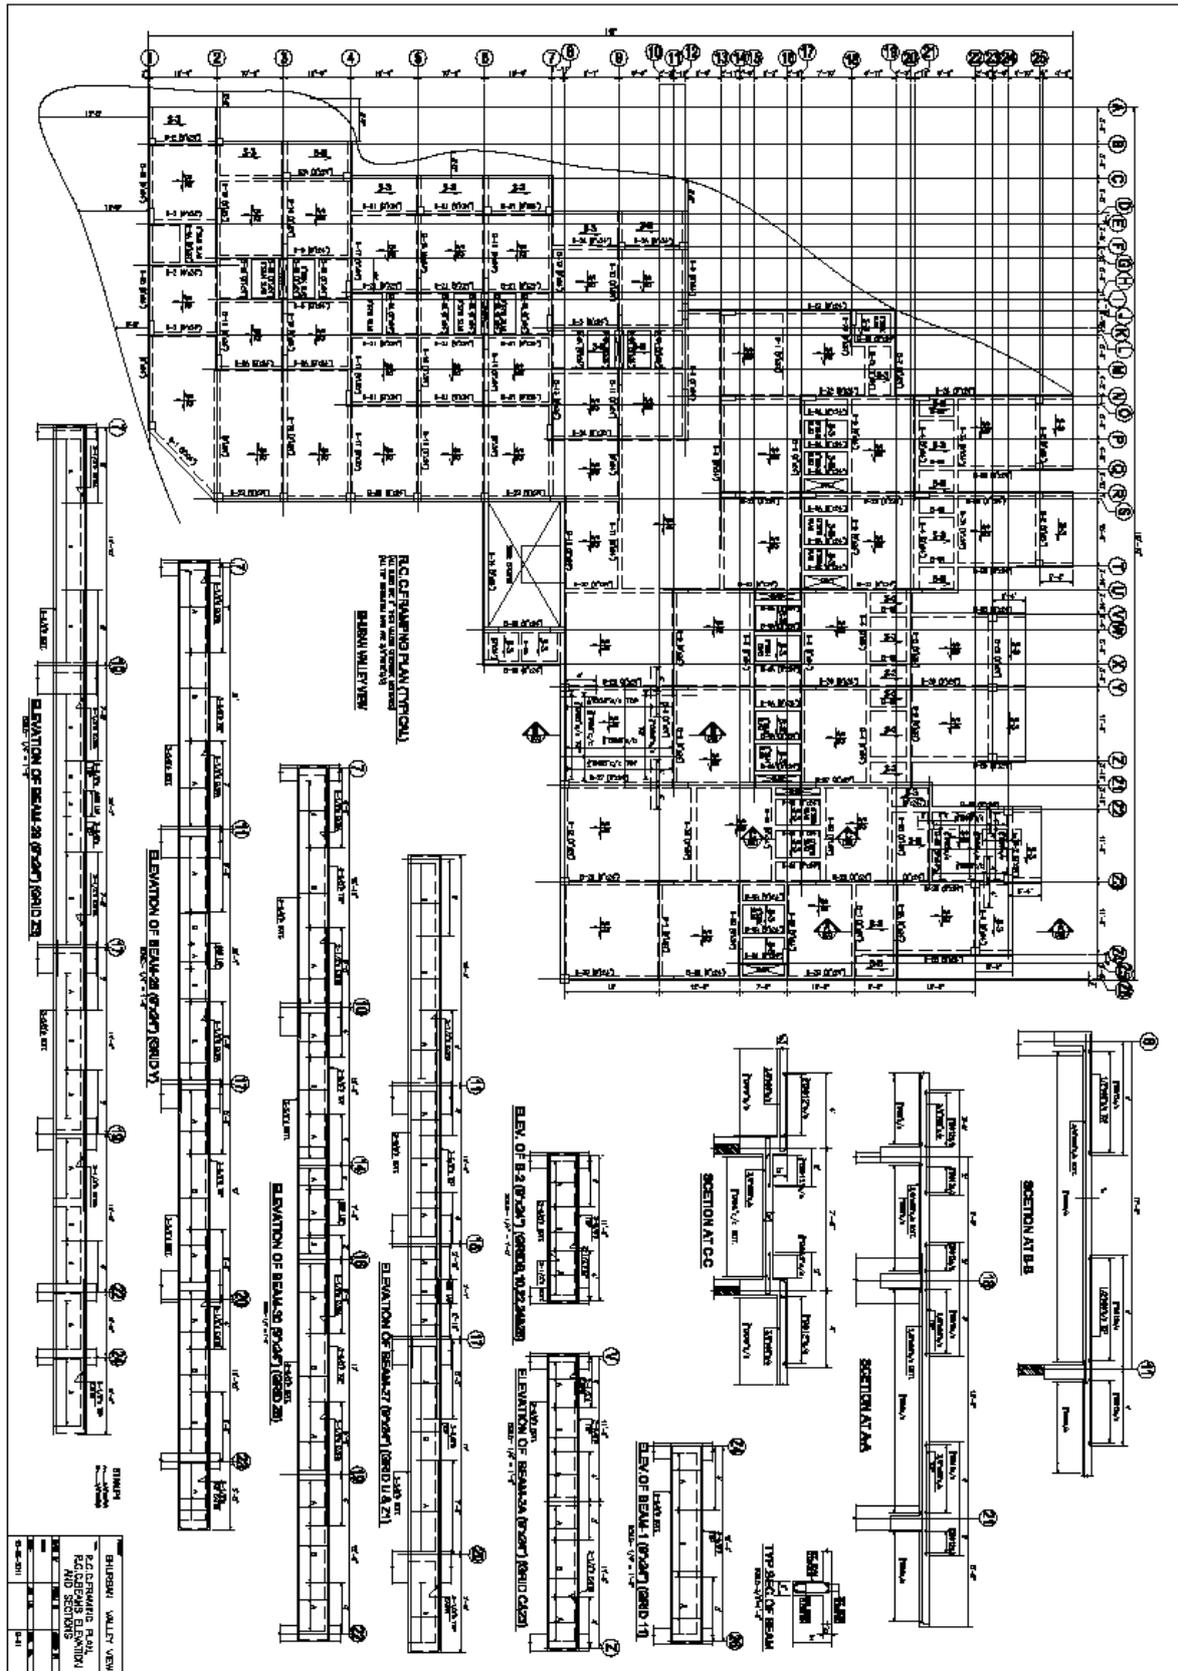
Structural framing for typical residential floor and RCC beam elevations
